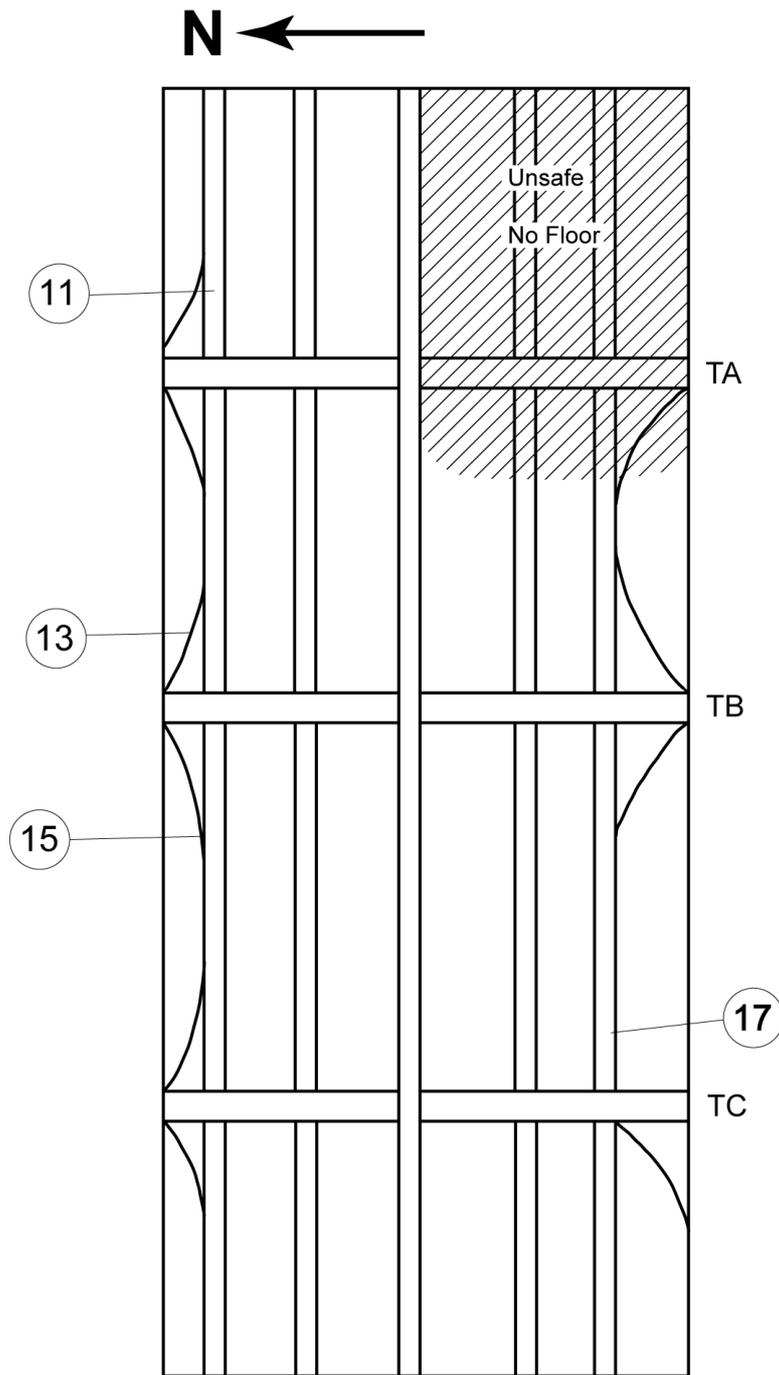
Sketch plan of the hall range roof showing some of the sample locations
